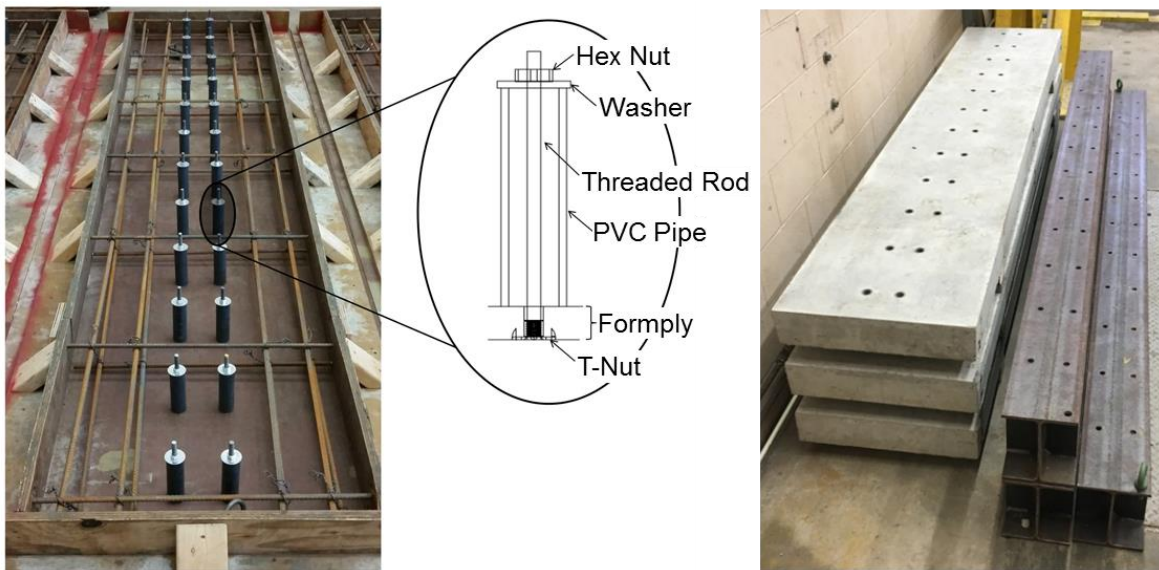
Formwork for TB specimens (left), and cast slabs and beams (right) (Balkos, 2017).
